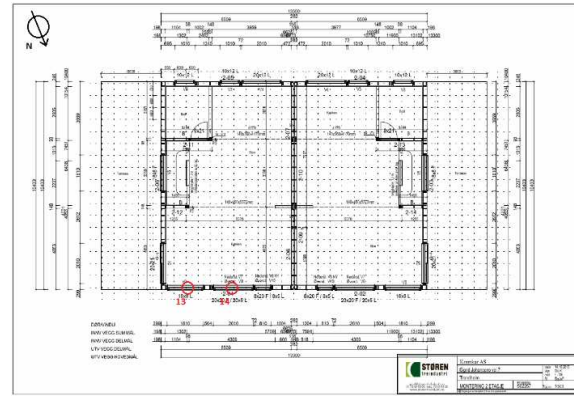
The second floor of the building, with the two sensors in the roof construction indicated with circles
